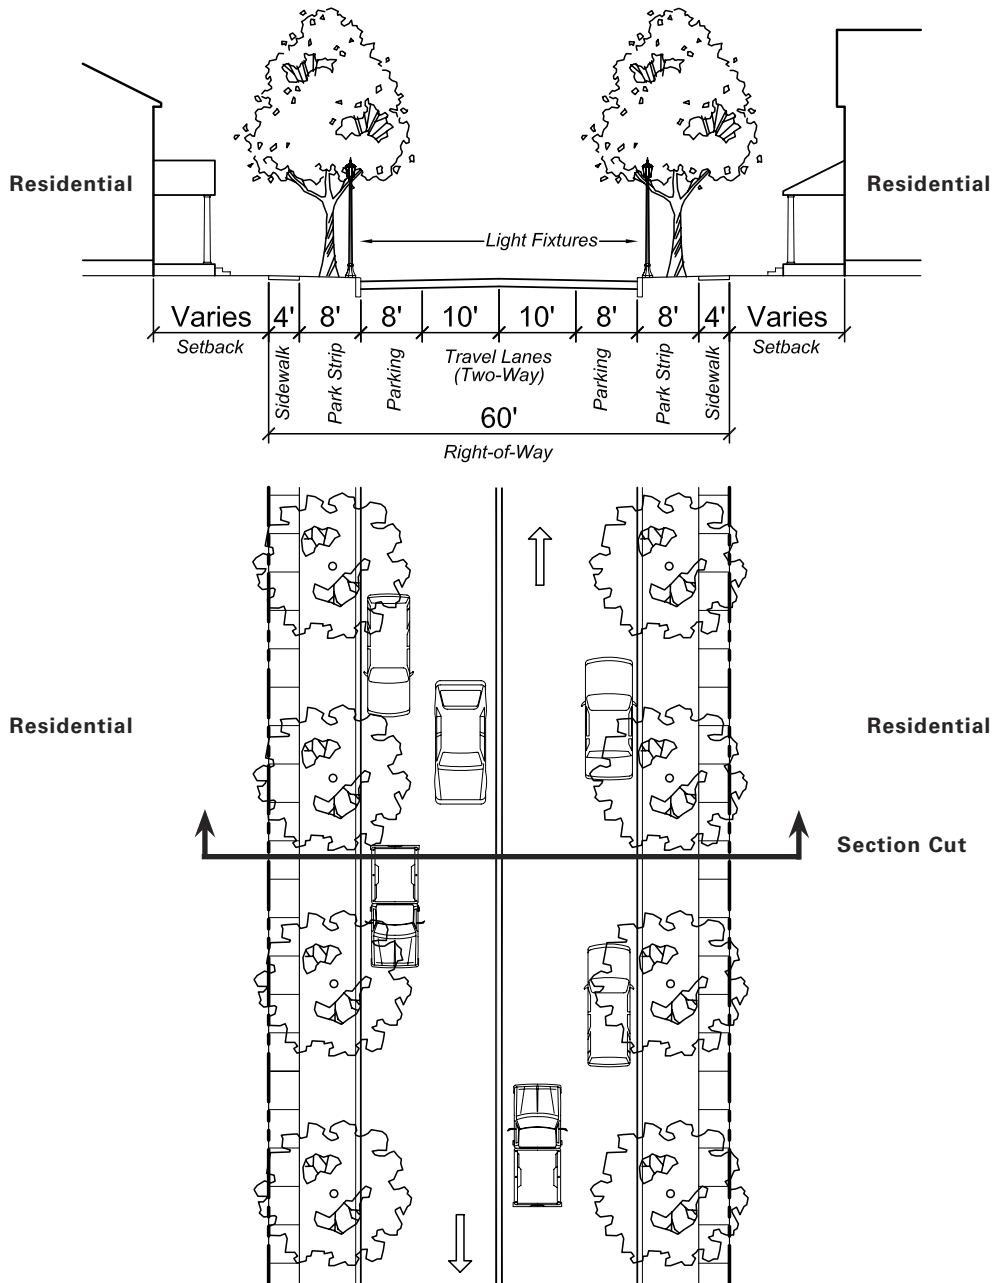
Proposed Section and Plan: Neighborhood Street A
